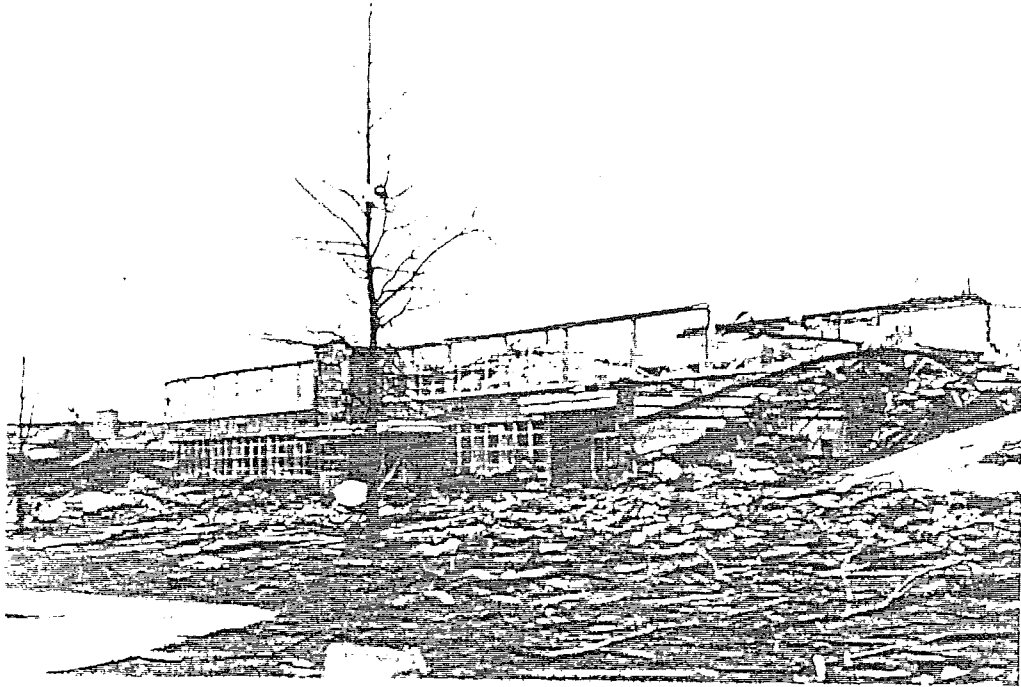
XENIA HIGH SCHOOL, TWO STORY BUILDING. The second story was totally gone. The roof system consisted of open web steel joists.
